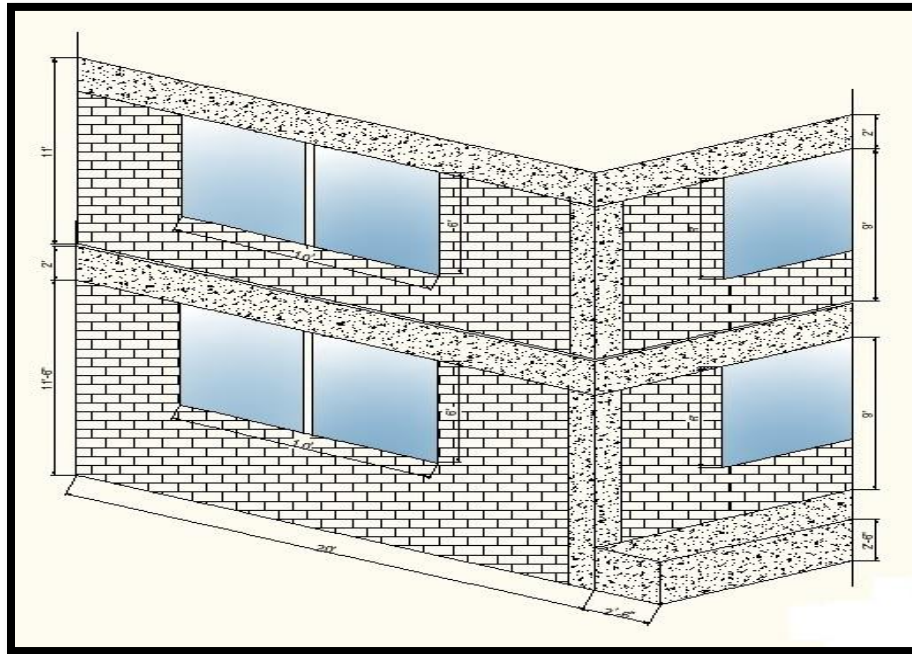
The addition of storey to existing frame structure and the calculated additional loads on single footing has been calculated
